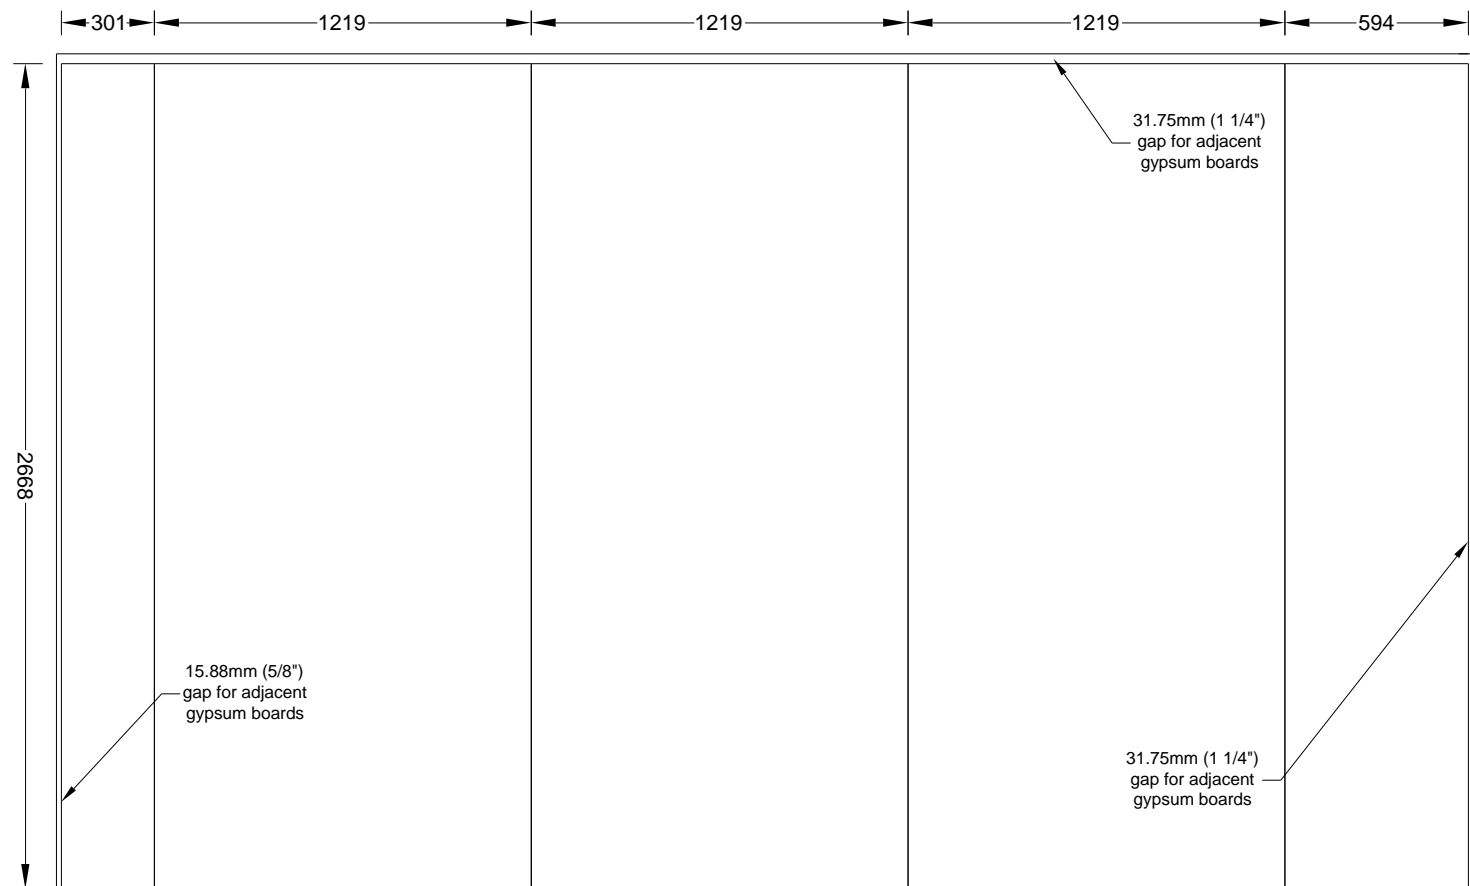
Test 1-5 Large Compartment CLT - W3 - Gypsum Layout - Face Layer
